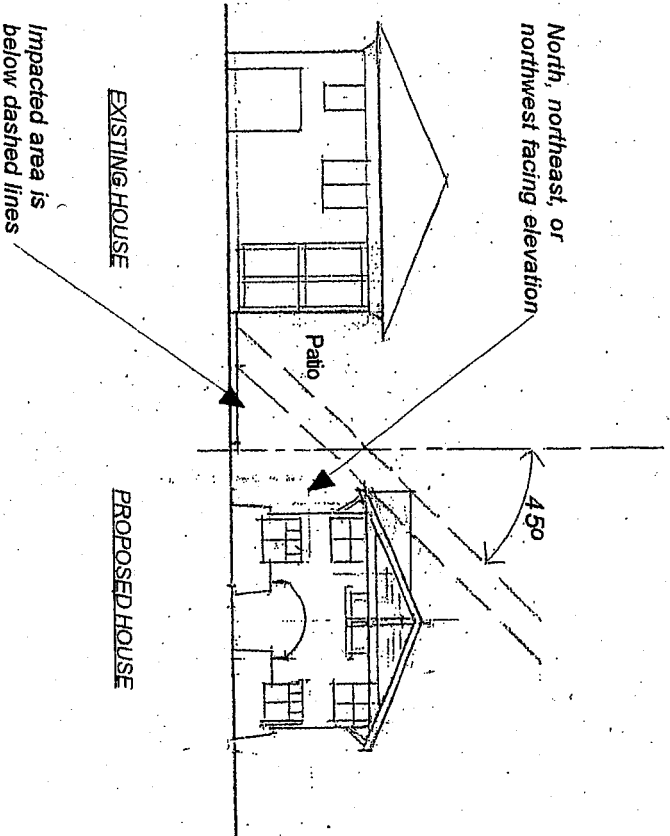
45 DEGREE SOLAR INCLINE PLANE*Example shows same house as in Figure 2.1*45 degree solar incline plane instructions:
